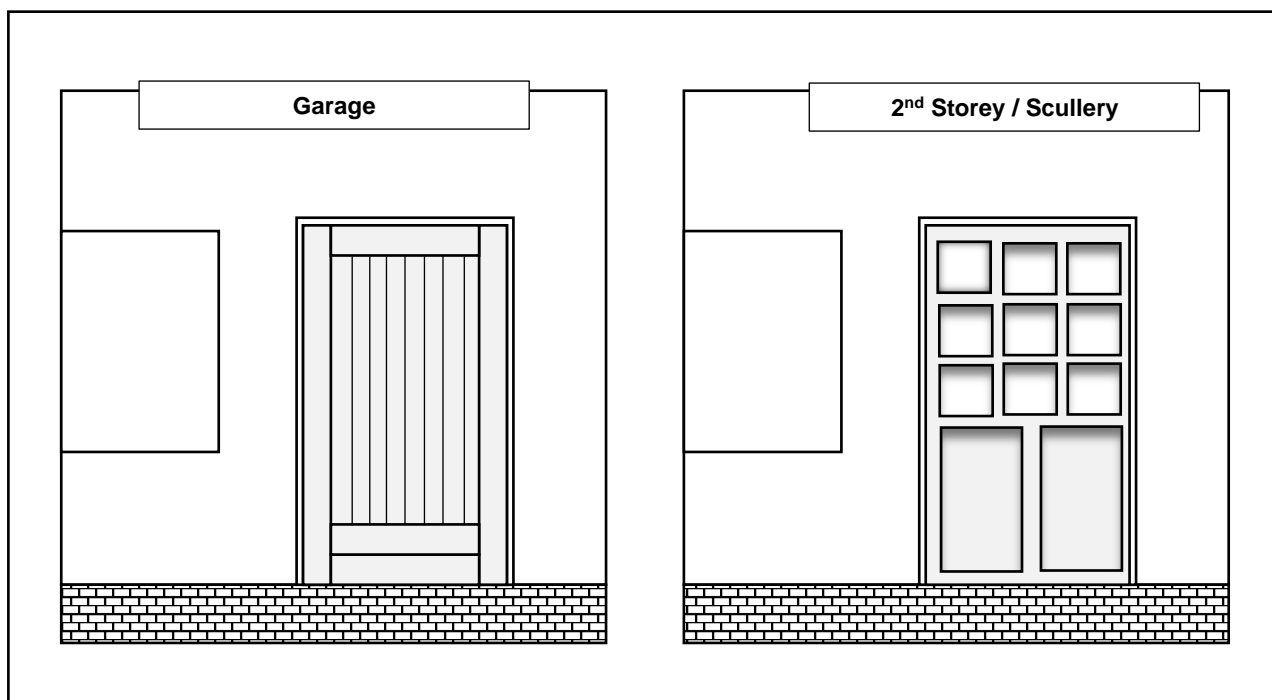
Garage, Scullery, and 2nd storey Door Design Options
